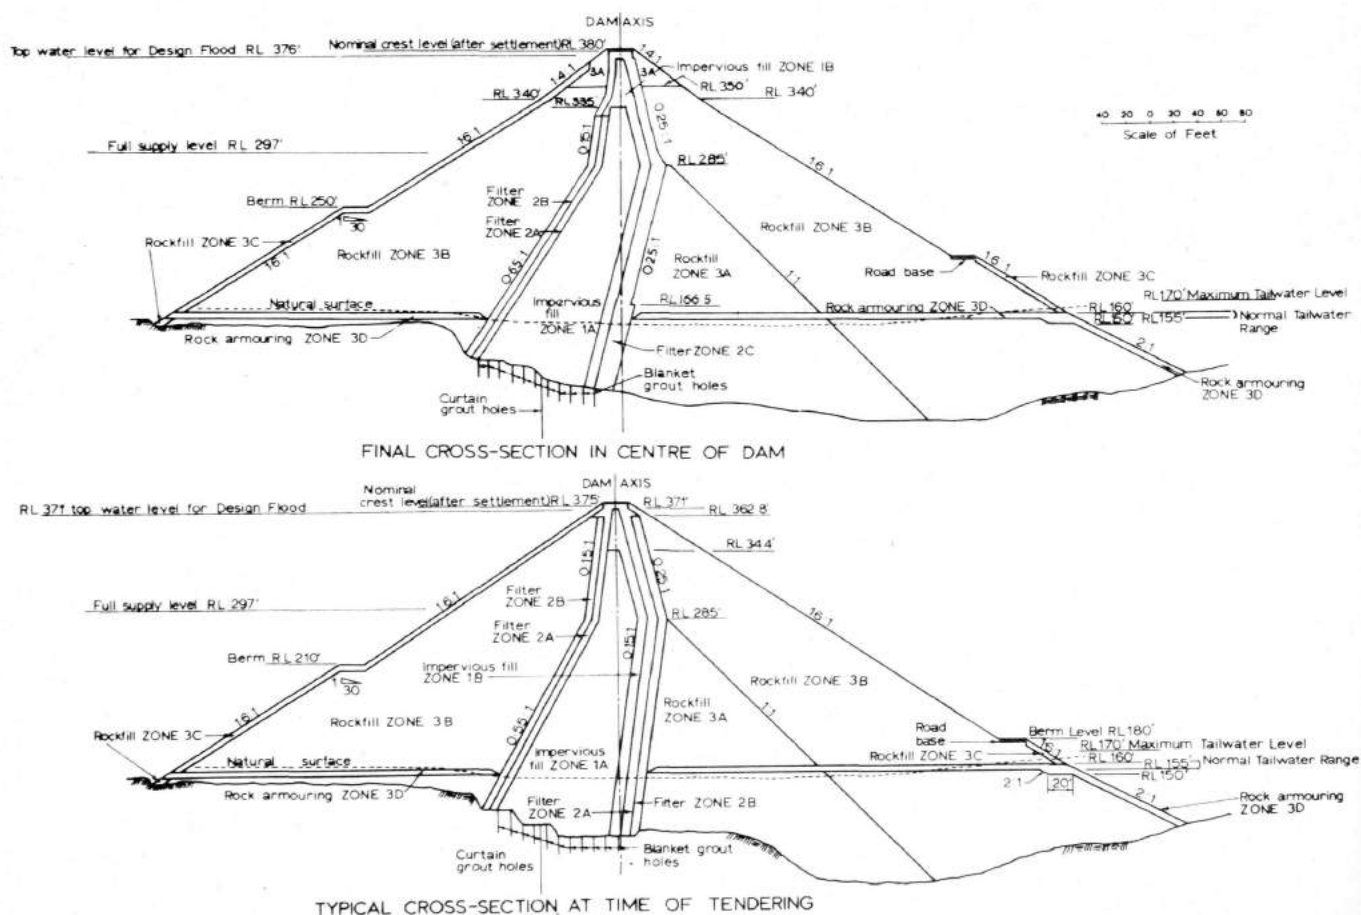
Ord River Dam—Embankment Cross-Sections.
